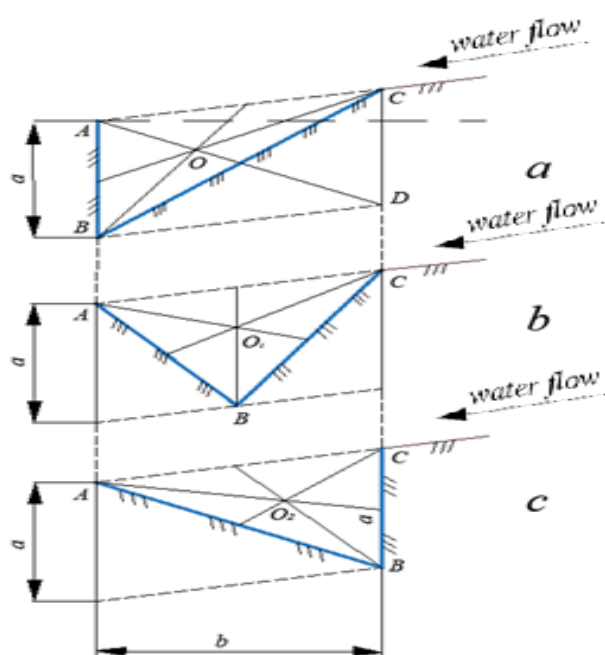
Schemes of the foundation of the shape of an opening ditch
